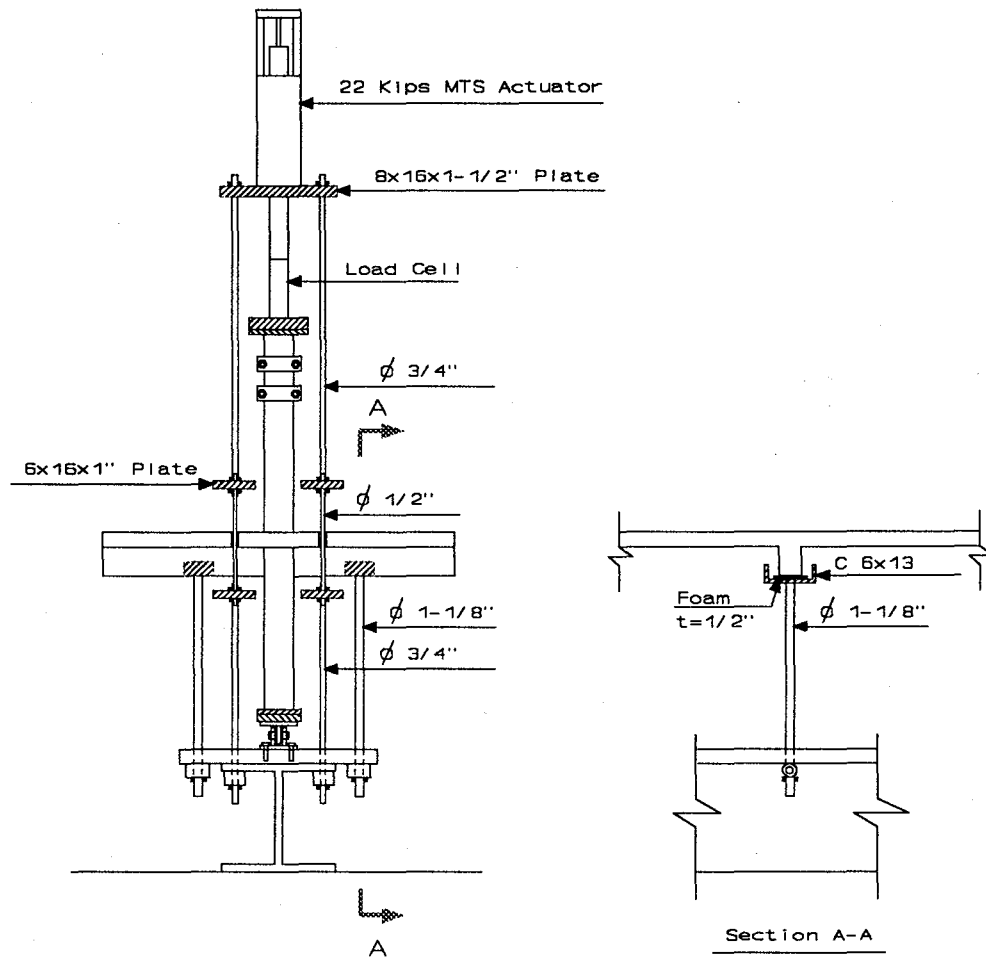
Transverse Section of Test Rig and Subassembly
